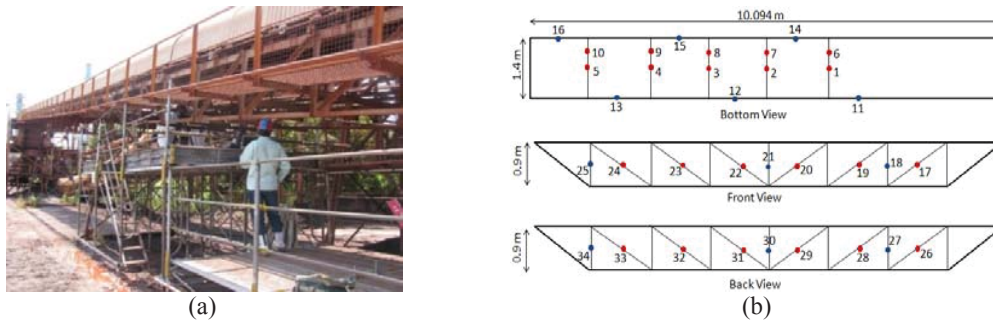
(a) A real belt conveyor and (b) Measurement points of the belt conveyor
